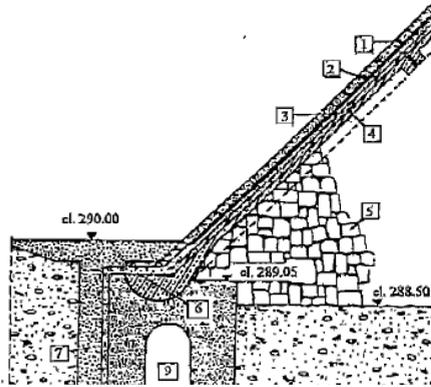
Detailed cross section of upstream toe of Contrada Sabetta Dam (modified after Cazzuffi 1987 and ICOLD 1991): [1] 0.20 m thick concrete slabs, [2] one sheet of bituminous paper-felt + two sheets of polyisobutylene geomembrane (2.0 mm thick) + bituminous adhesive, [3] porous concrete (0.10 m thick), [4] reinforced concrete slabs (0.25 m thick), [5] dry masonry (thickness ranging from 2.00 to 3.00 m), [6] joint between plinth and upstream facing, [7] plastic concrete diaphragm wall, [9] inspection and drainage gallery.
